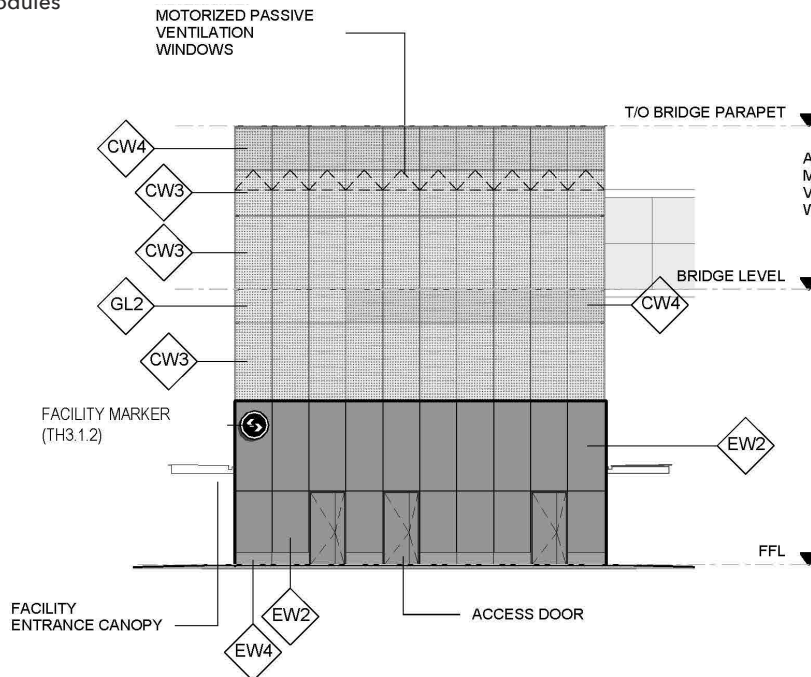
Staffed Station building (bridge platform access) side elevation of Ancillary Module
